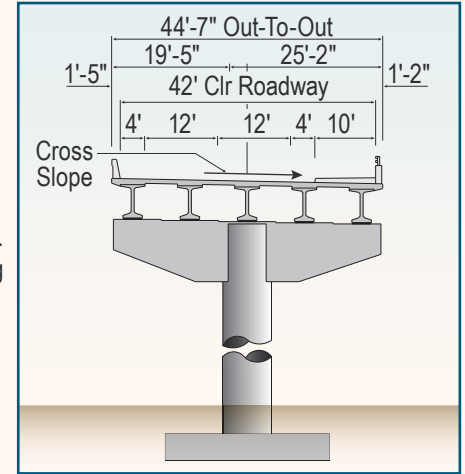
Hammerhead Pier Cap and Column of the rock layer to
